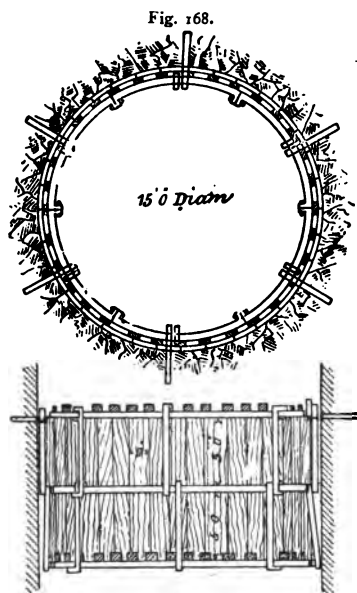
Walker's temporary lining for shaft: plan. FIG. 169.—Ditto: elevation.
